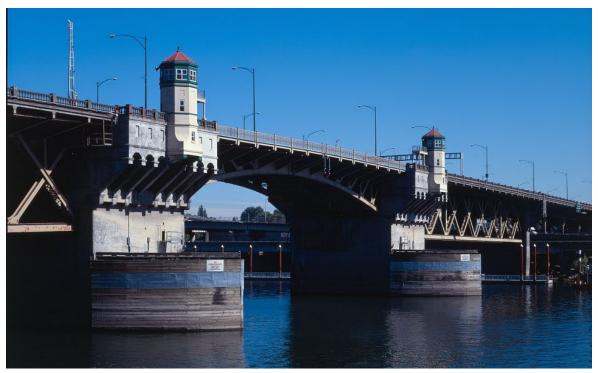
Detail of the operator's houses and drawspans of Burnside Bridge, looking northeast. Burnside Bridge, Spanning Willamette River at Burnside Street, Portland, Multnomah County, Oregon. Photos from Survey HAER OR-101 (Library of Congress).
